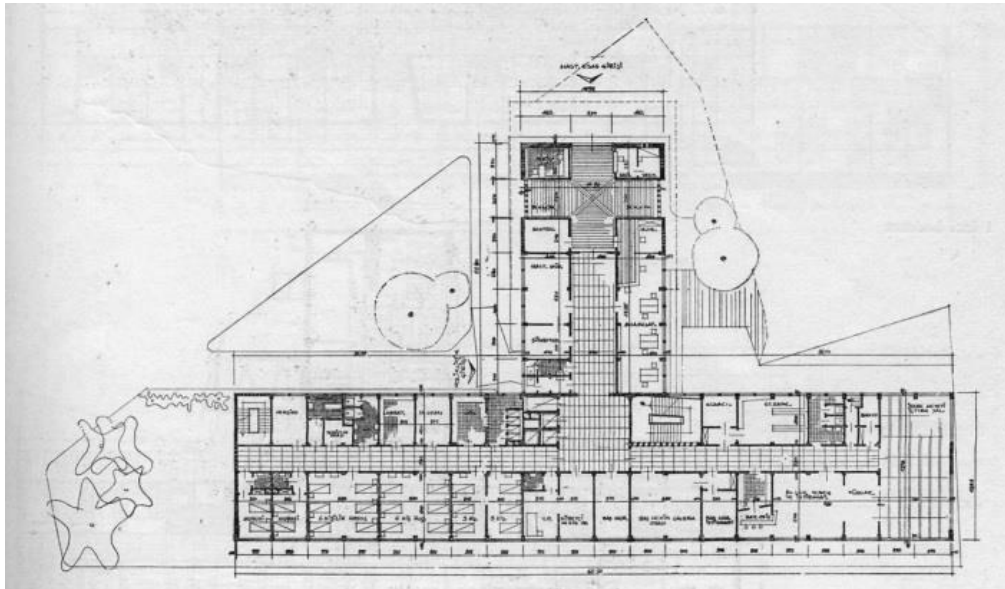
Ground Floor Plan of the İstanbul *Esnaf* Hospital
